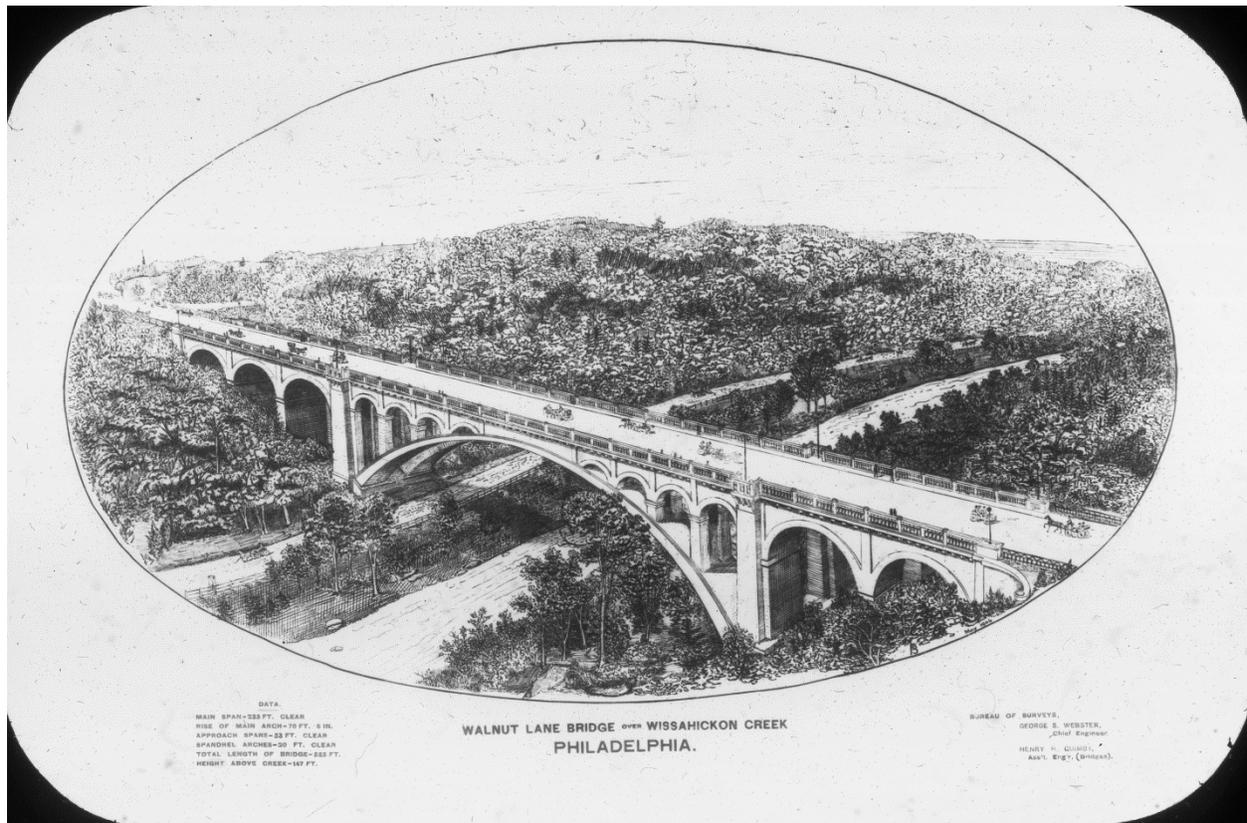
Walnut Lane Bridge over the Wissahickon Creek, 1908.
